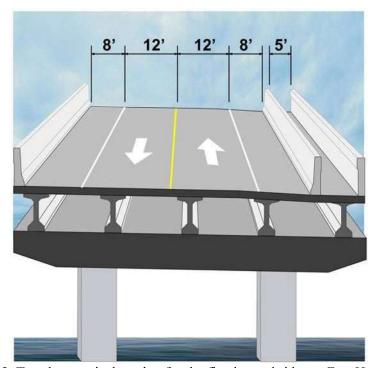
Two-lane typical section for the fixed span bridge at Fort Hamer Road.
